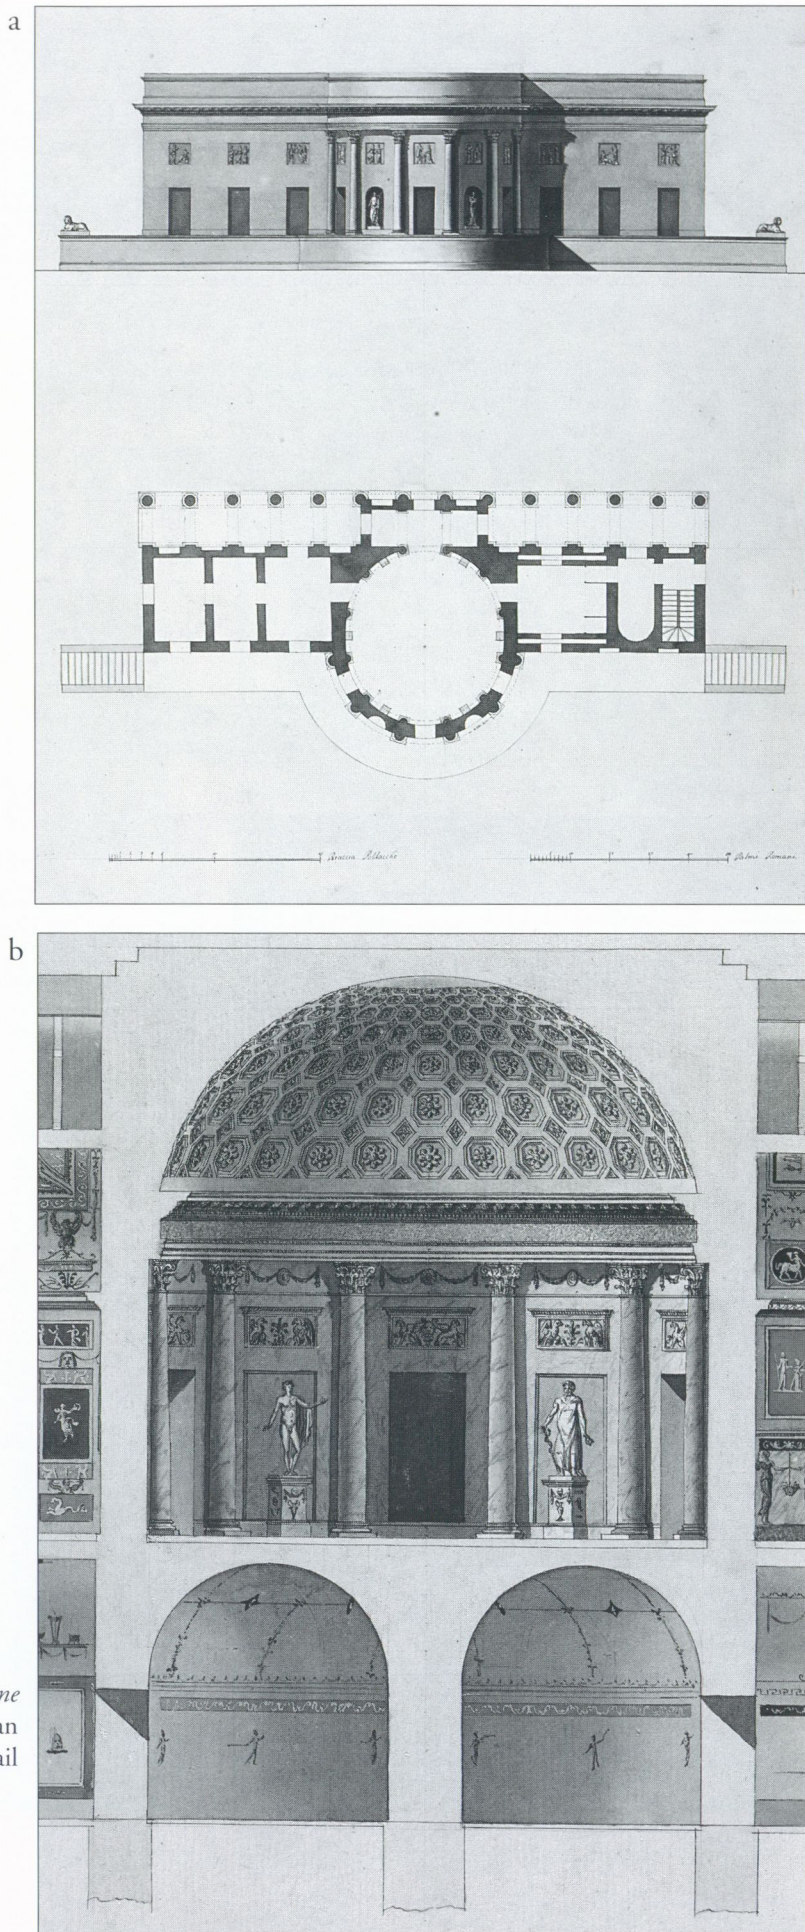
a: Potocki, "pendant" to *Laurentine Villa*, elevation and ground plan (WAF 68, Rys. J. 5.026); b: Detail of Fig. 25
